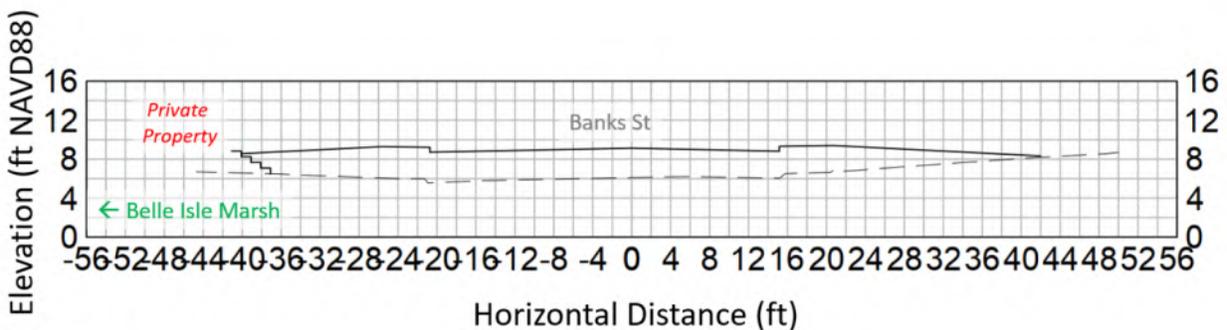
Banks Street with an elevation minimum of 9 ft (NAVD88) in cross-section.
